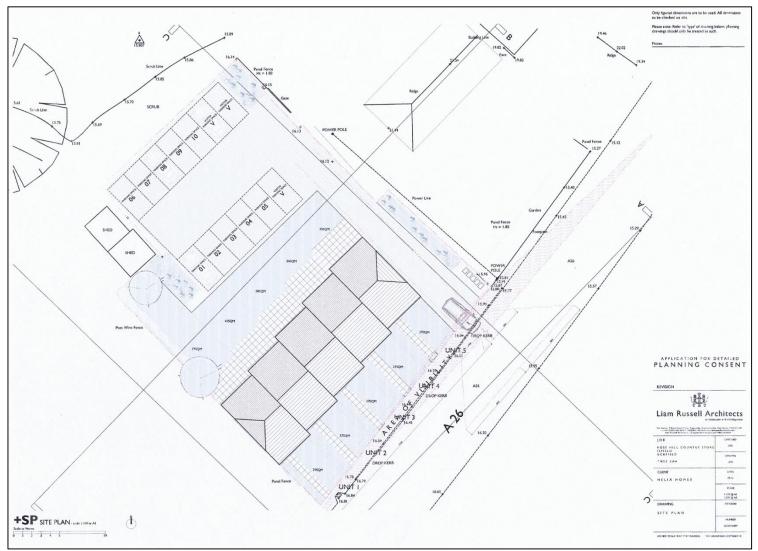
Rosehill Country Store: Site development Plan (adapted from architects drawing)
